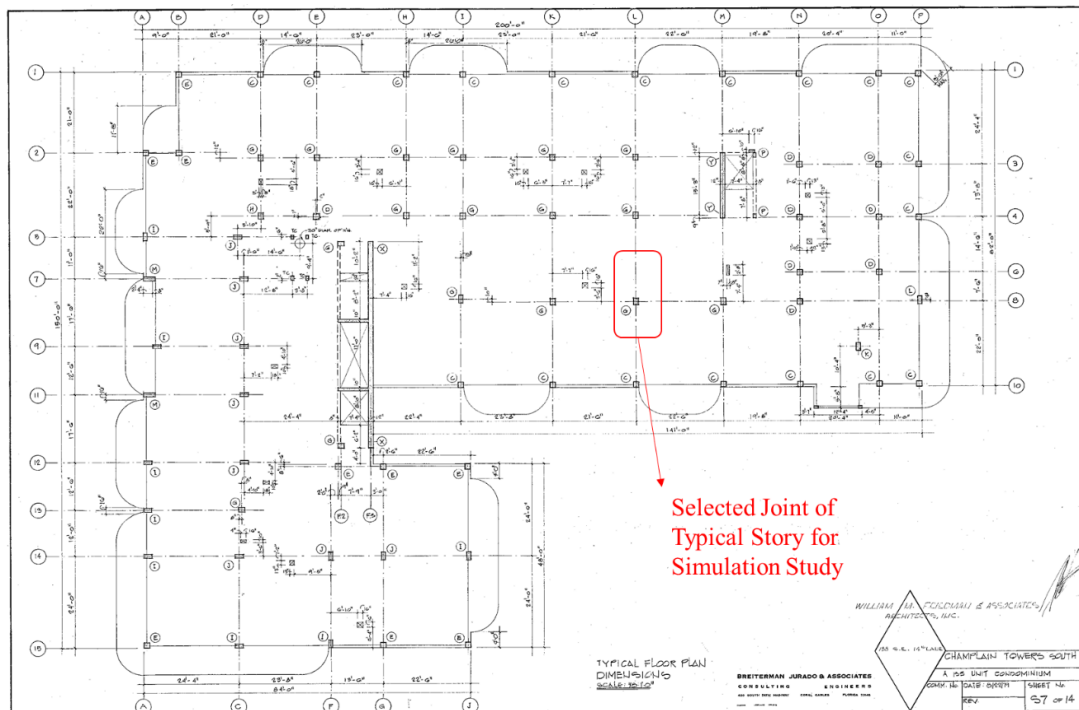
Selected Joint of Typical Floor Plan for Simulation Study [6]
